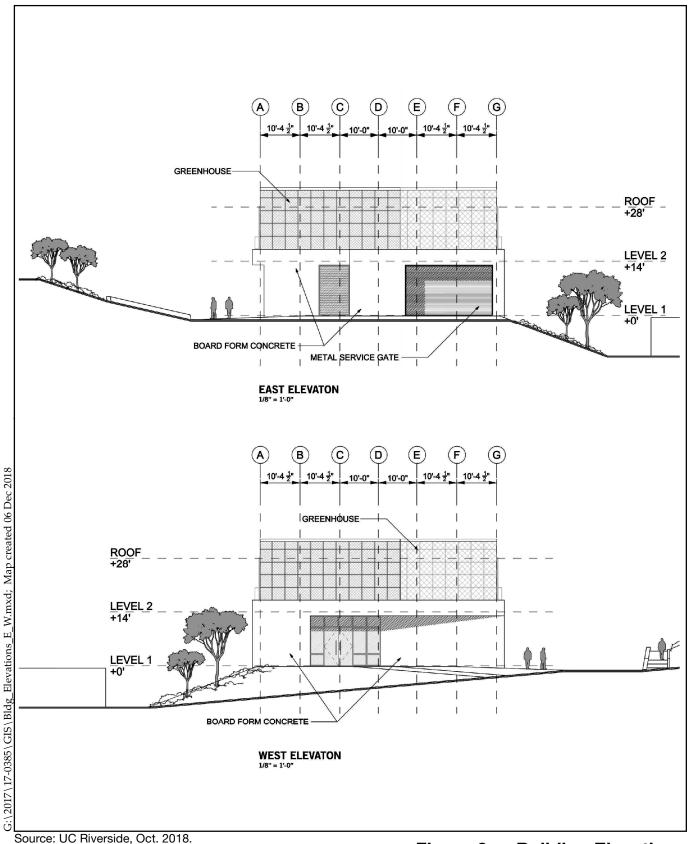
Building Elevations UCR Plant Growth Environments Facility
